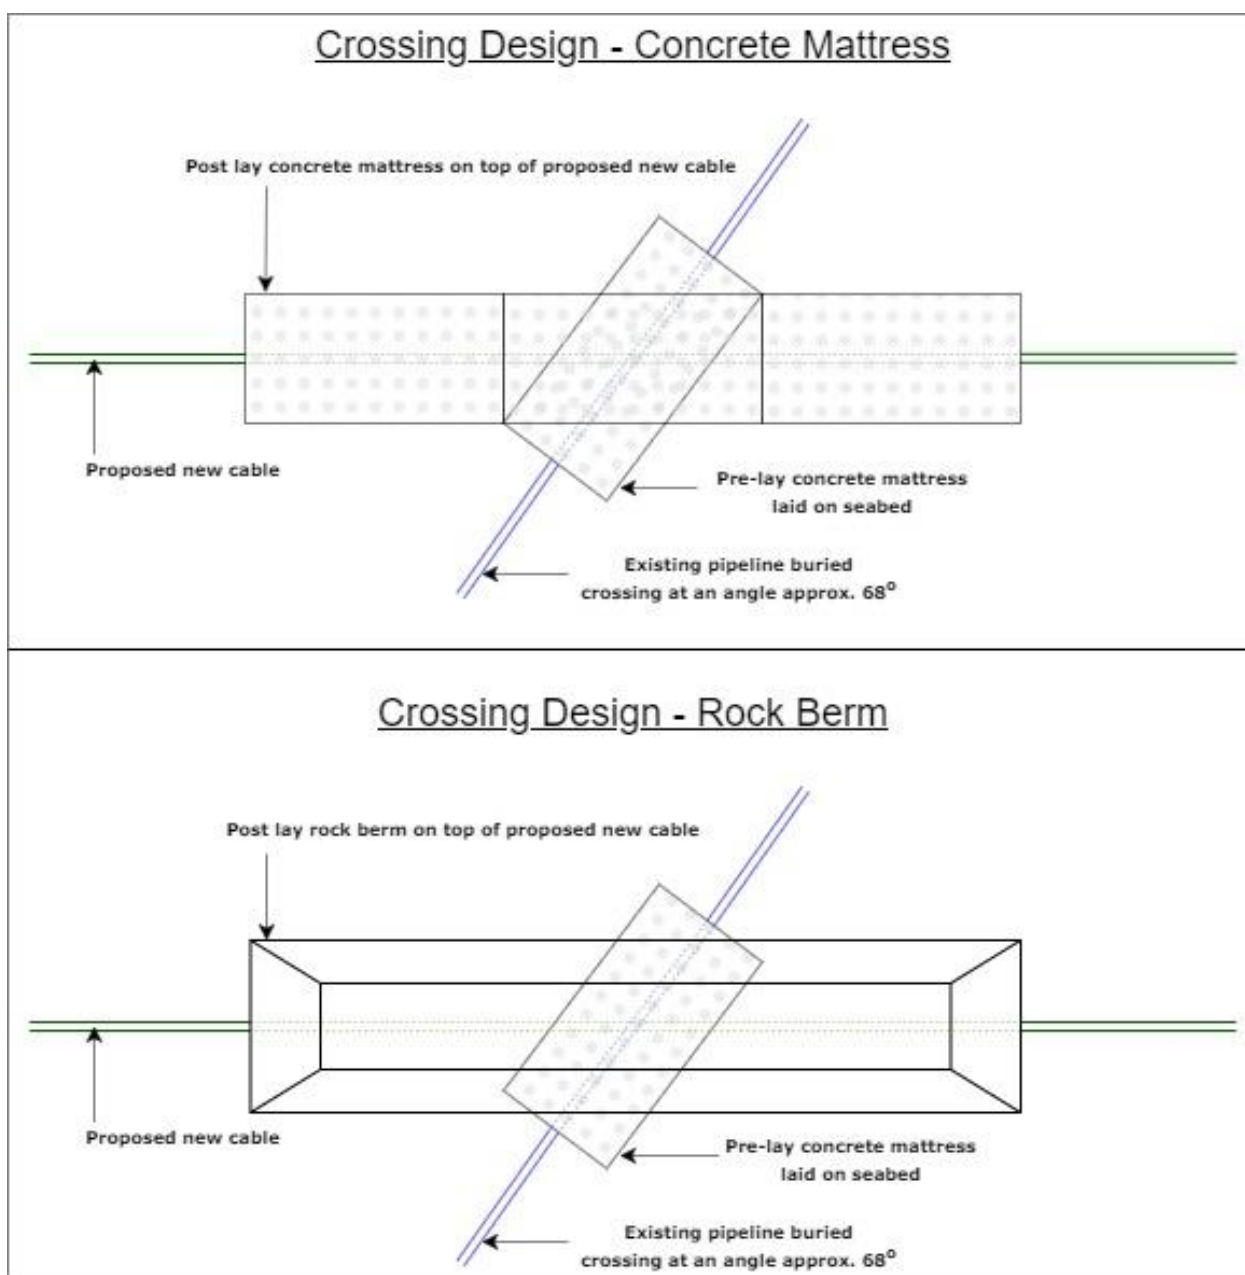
Typical Power Cable Crossing Buried Pipeline / Cable (Single Crossing)
